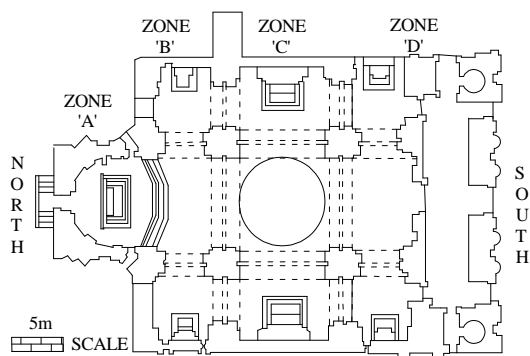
Ground floor plan of Our Lady of Divine Providence Church (Source: ASI, Goa)
